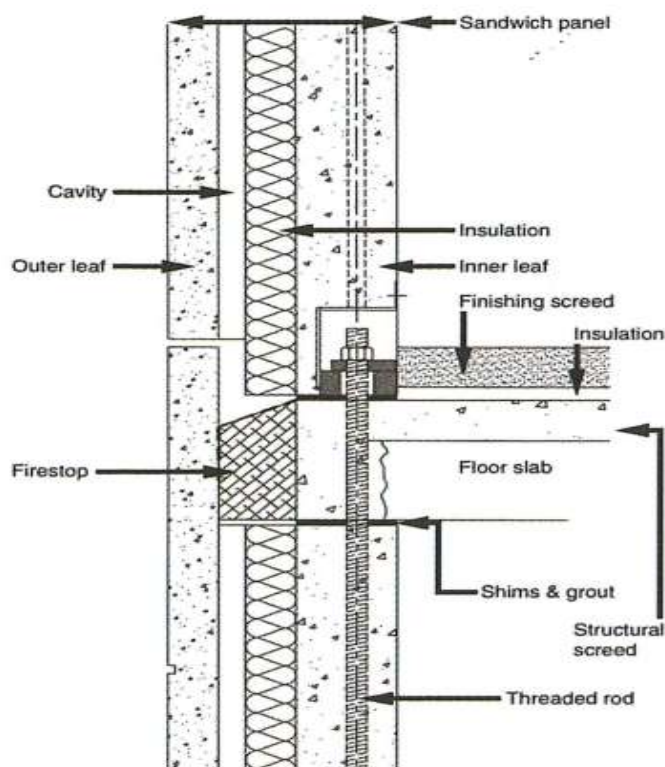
Typical detail section through panel-to-panel connection using threaded rods
